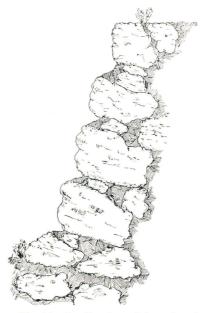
Profile of a soil-bound rock wall showing receding face and large stones held apart by stone chips in the soil-filled crevices.
